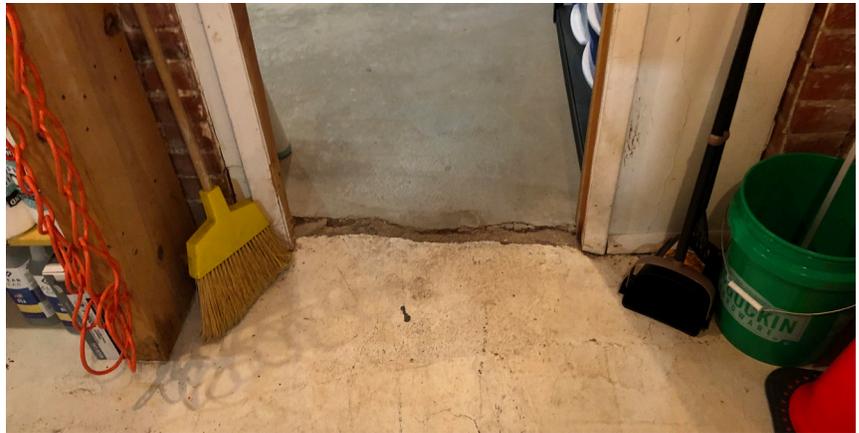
Concrete floor transition, 2020 (source: Ratio)
